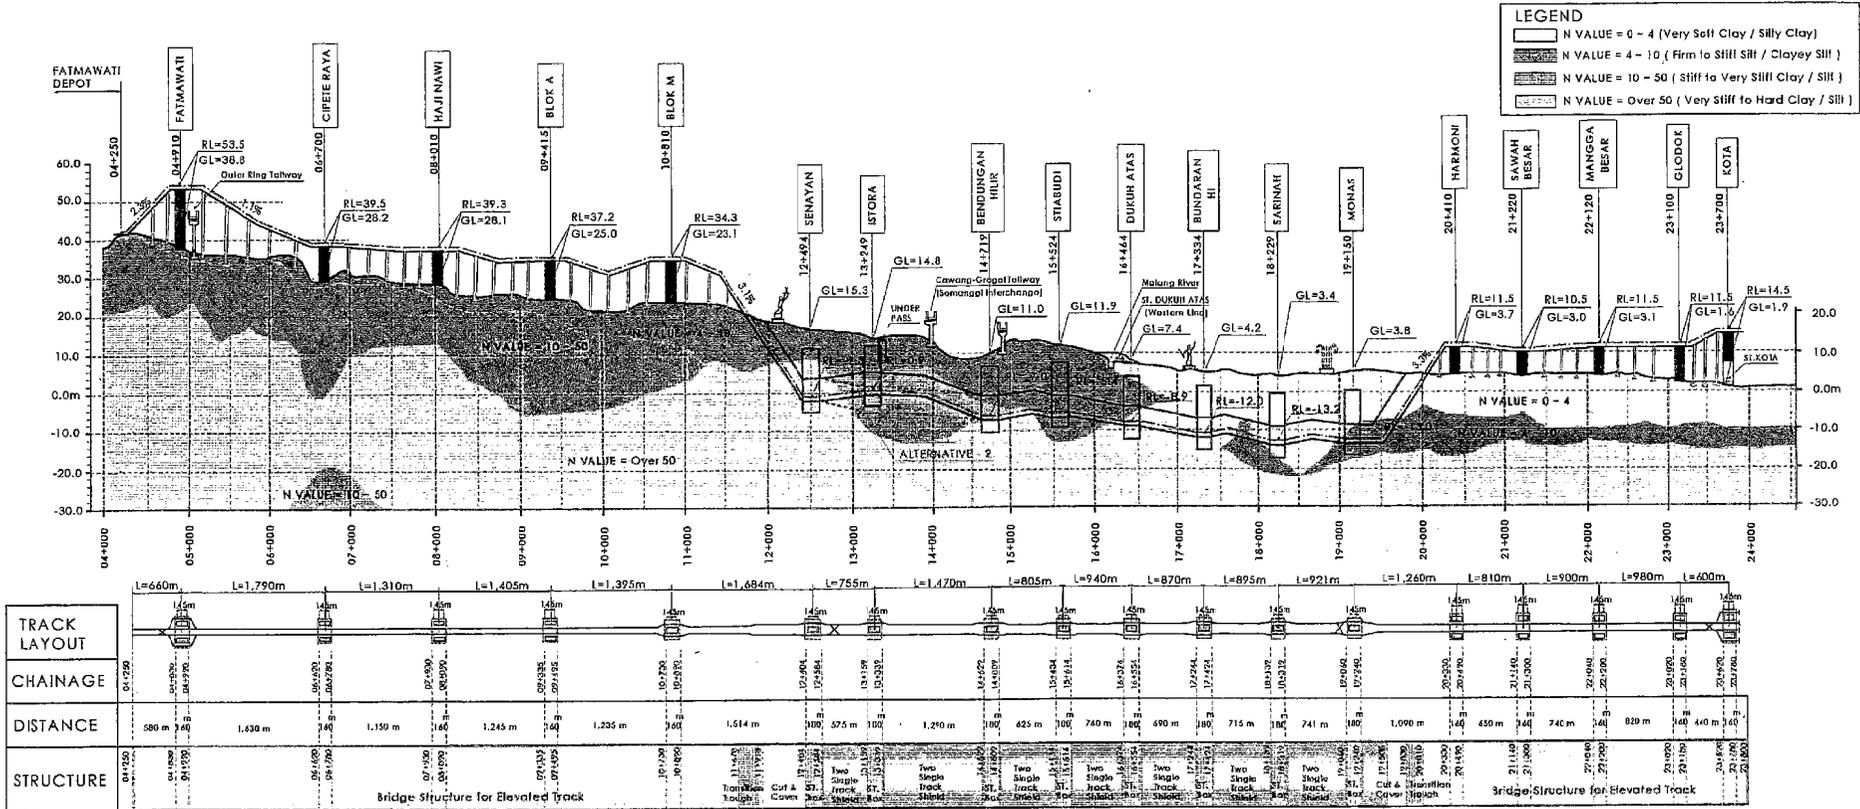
(a) Route, Profile & Track Layout Plan of Jakarta MRT Project (Alternative-1)
